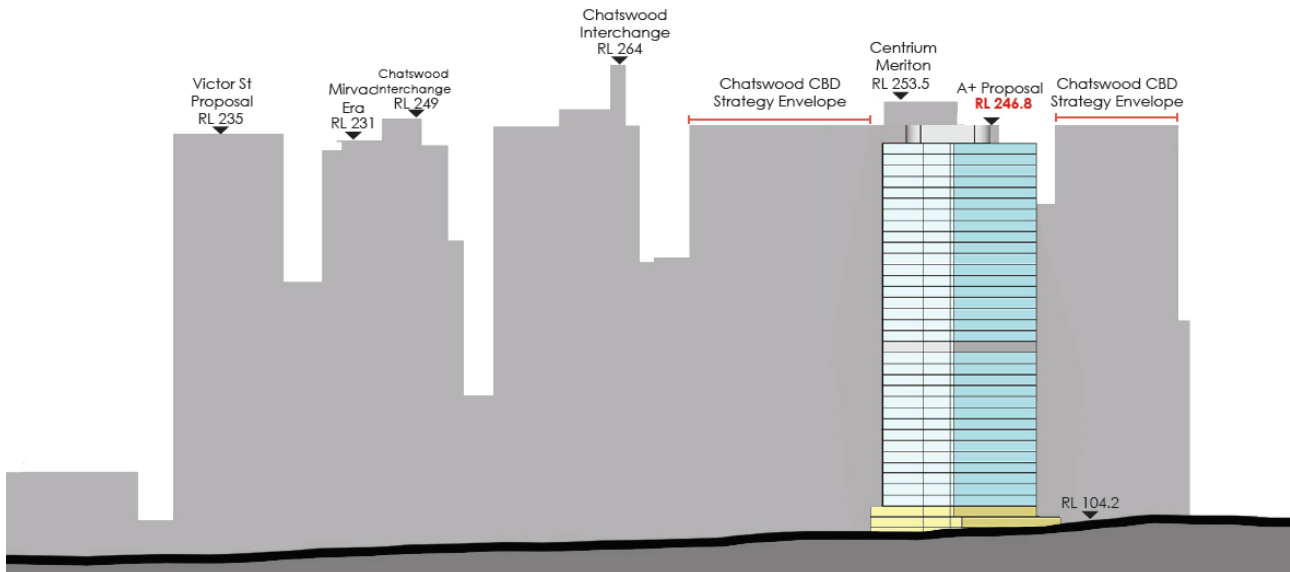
Proposed concept building envelope (north elevation) relative to the existing and proposed built environment in Chatswood and the Chatswood CBD Strategy envelope (source: a+ Design Group)
